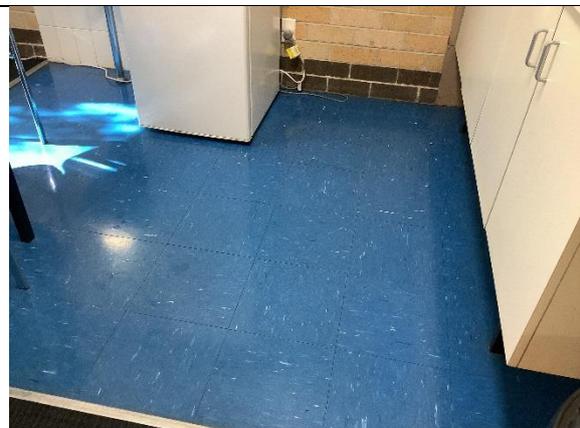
Building H – H.1.7,15,18 – Throughout – Floor Covering – Vinyl Tiles - Blue
